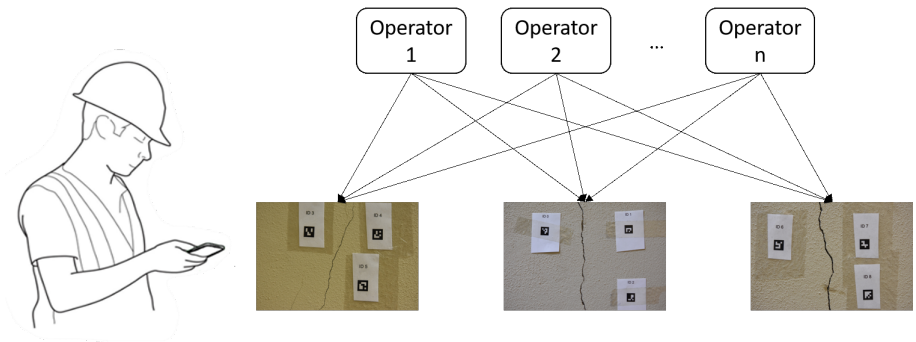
Cross Gage R&R method for non-destructive testing for crack assessment.
